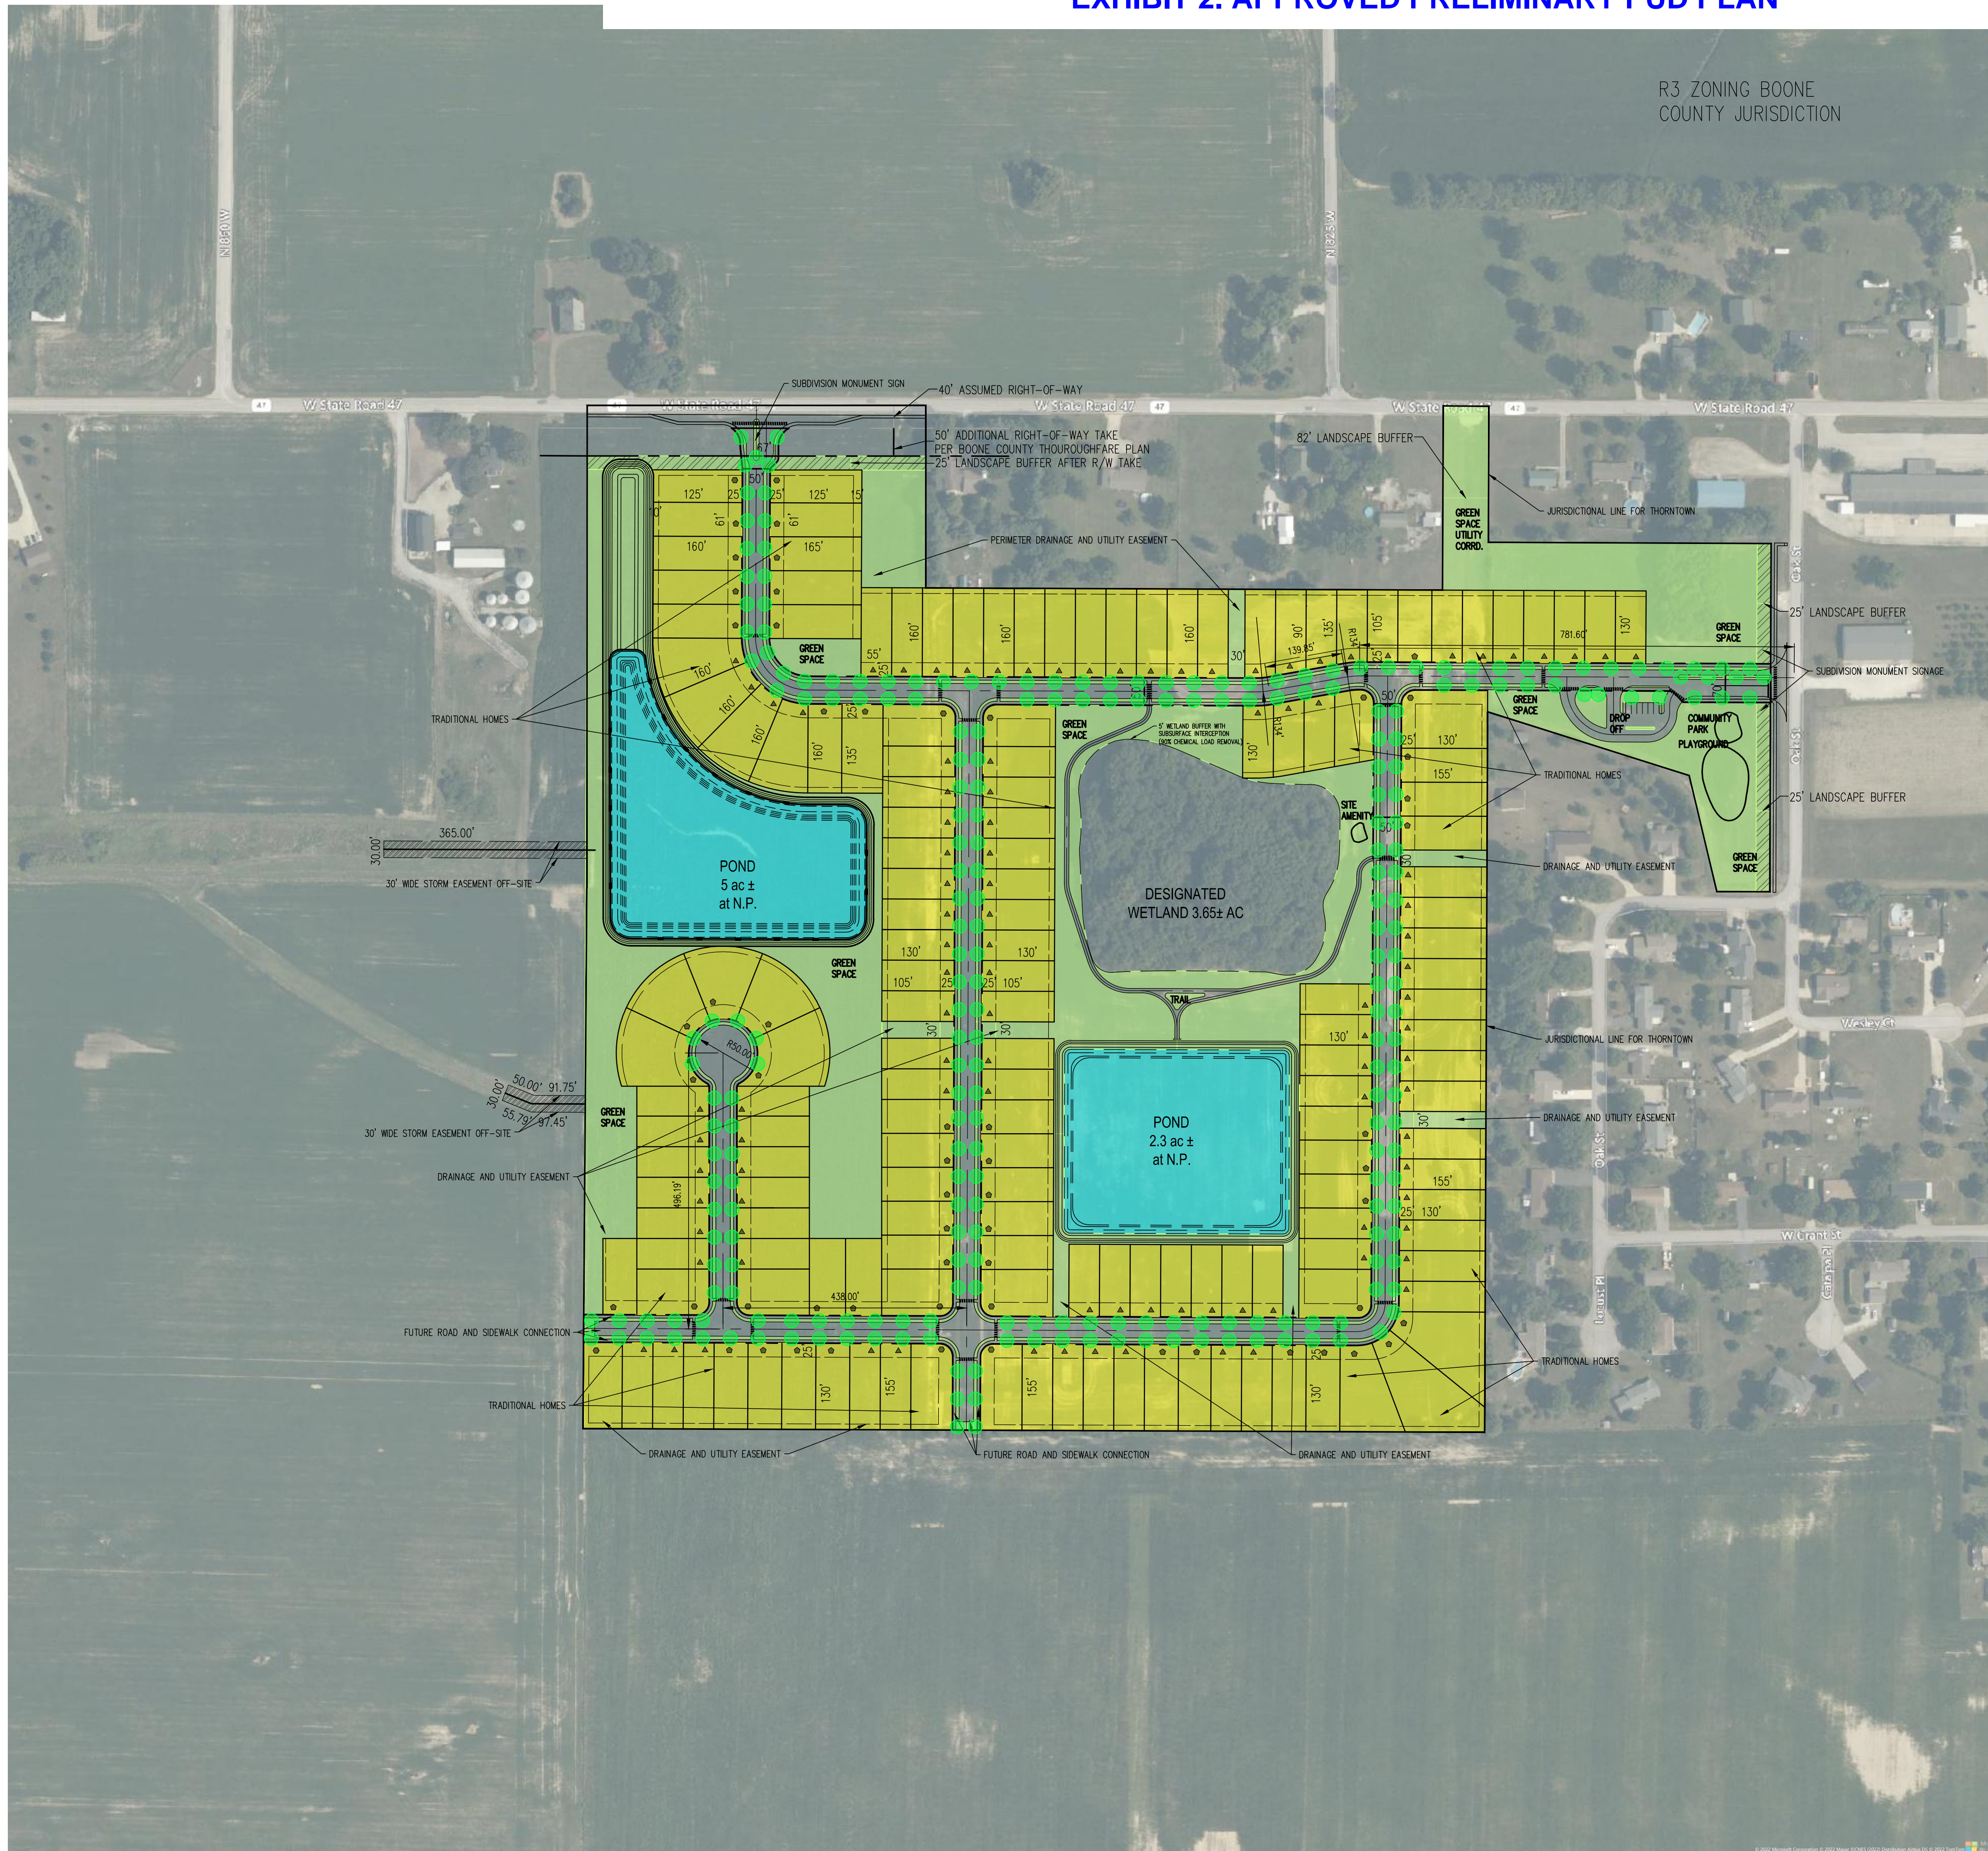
APPROVED PRELIMINARY PUD PLAN
